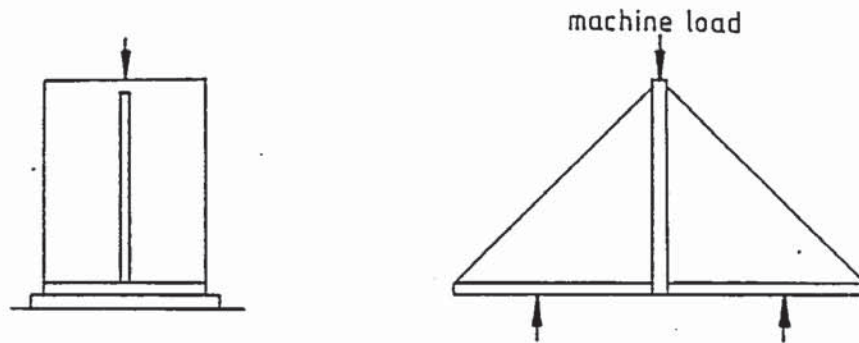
Back to back gusset plate testing arrangement adopted.
